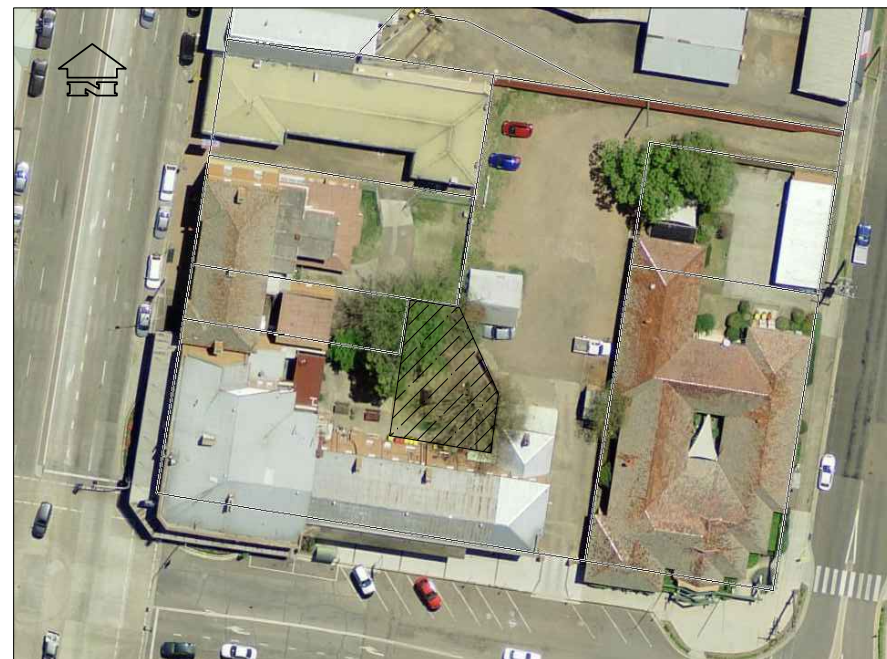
EXISTING AND PROPOSED PERVIOUS AREAS
